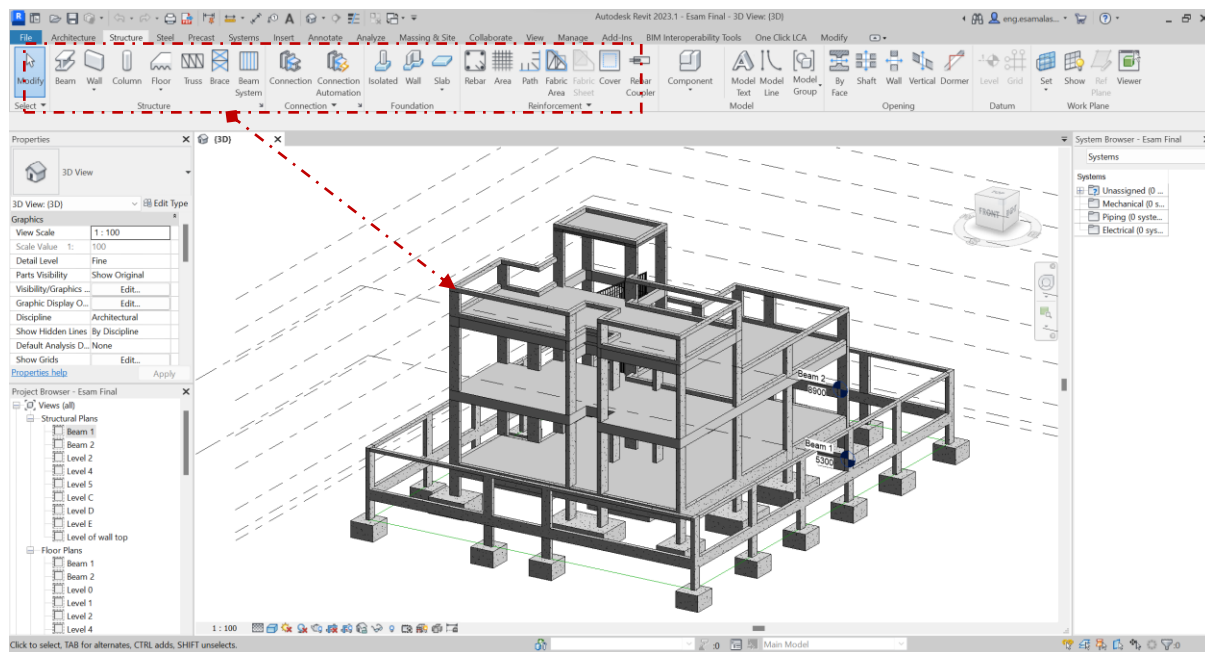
3D model drawings of site plan and building structures using Autodesk® Revit
